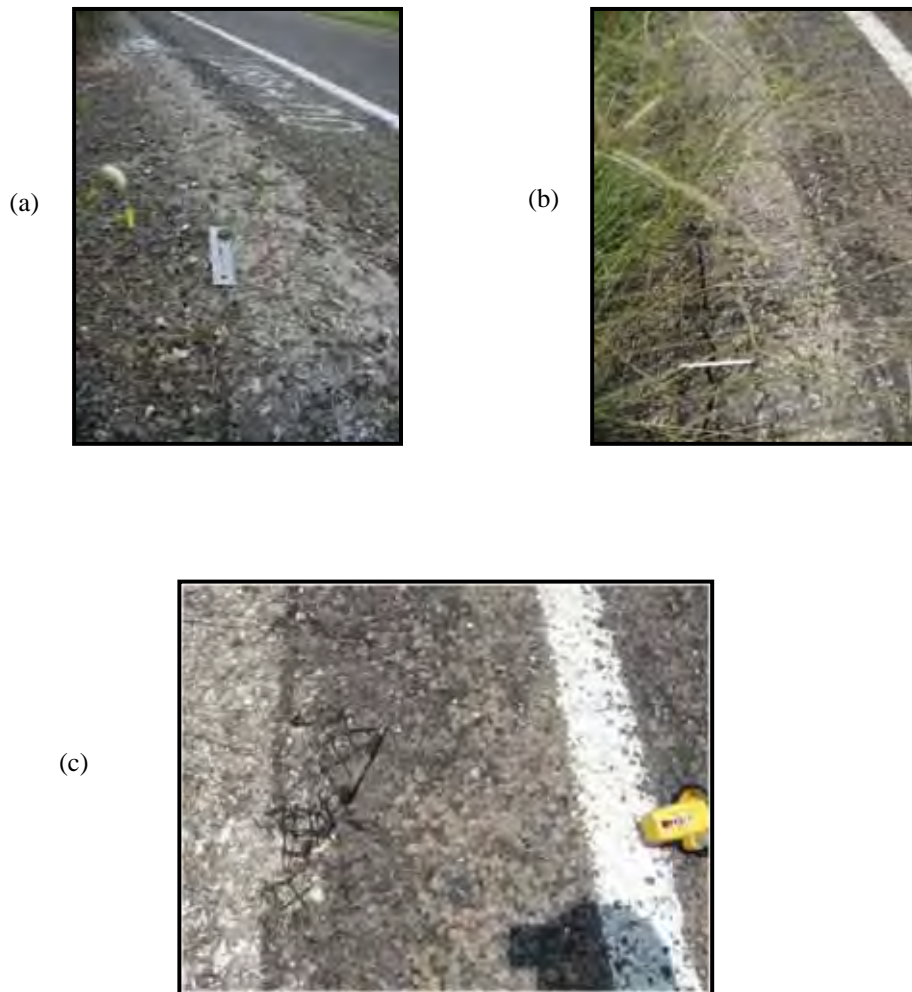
Cracks observed in Section 4Eb (#26)–No lime and PP geotextile.
